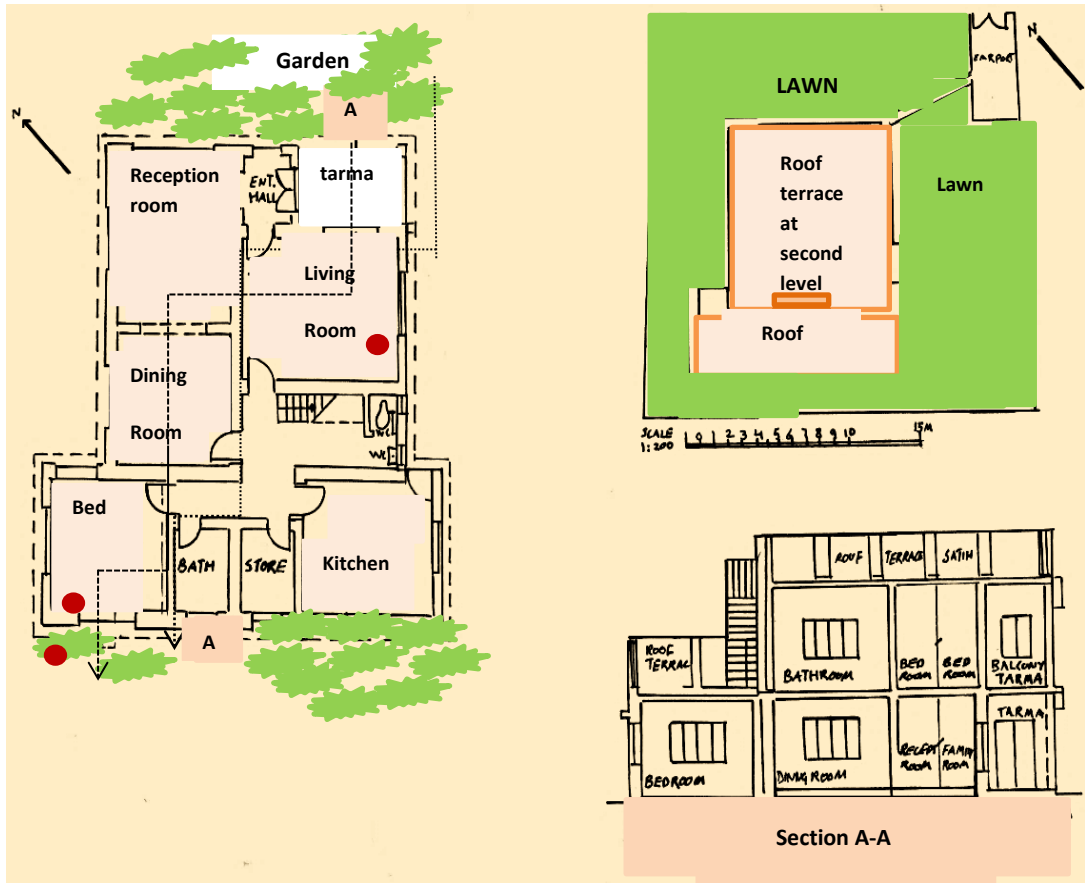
Site plan and ground floor level plan with section A-A (Researcher) Scale 1:100
